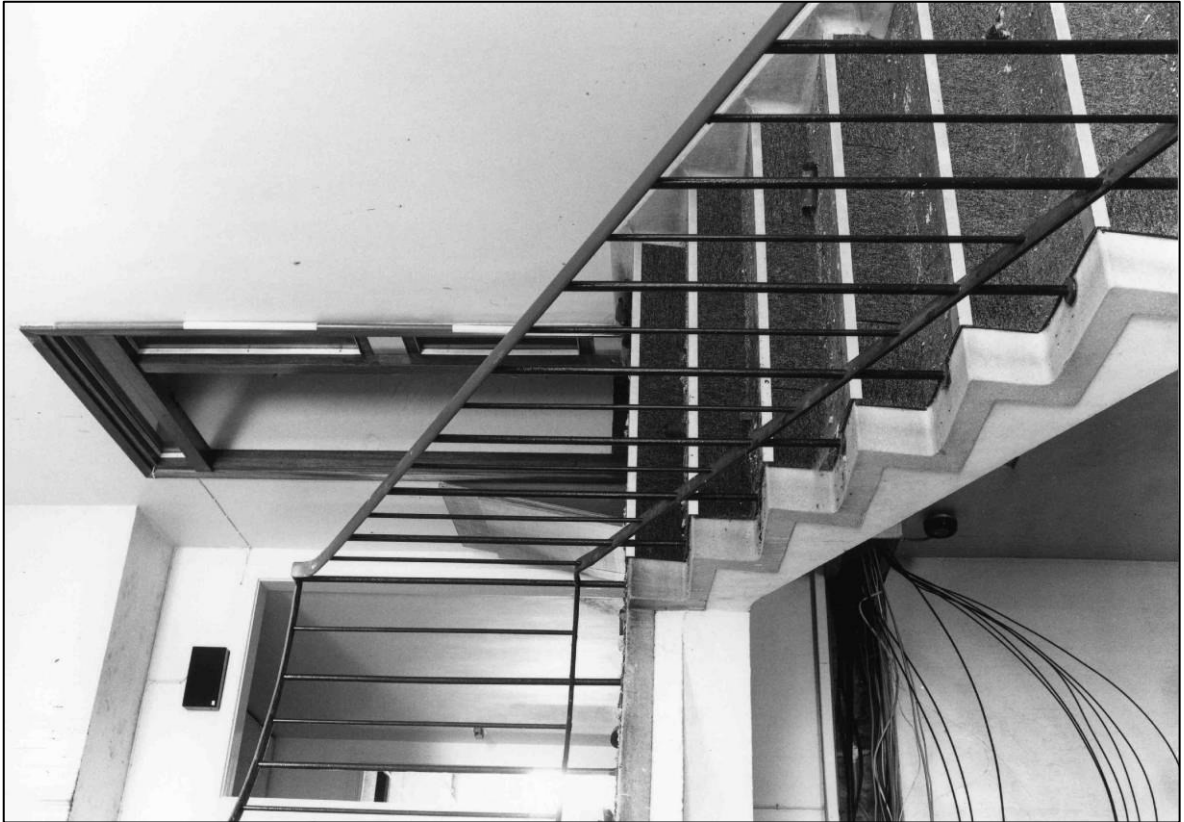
Staircase 1F4, detail of balustrade, looking NW (photo 4/4) (top to left).
